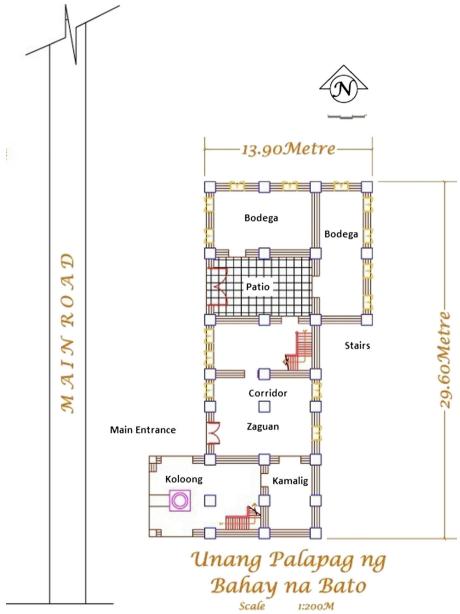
First floor plan of Structure A (after Sales in UP-ASP 2010 p. 32)
